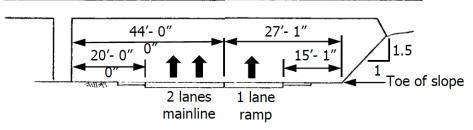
Bridge elevation view of horizontal clearances for a highway feature below the bridge carrying mainline and ramp.
